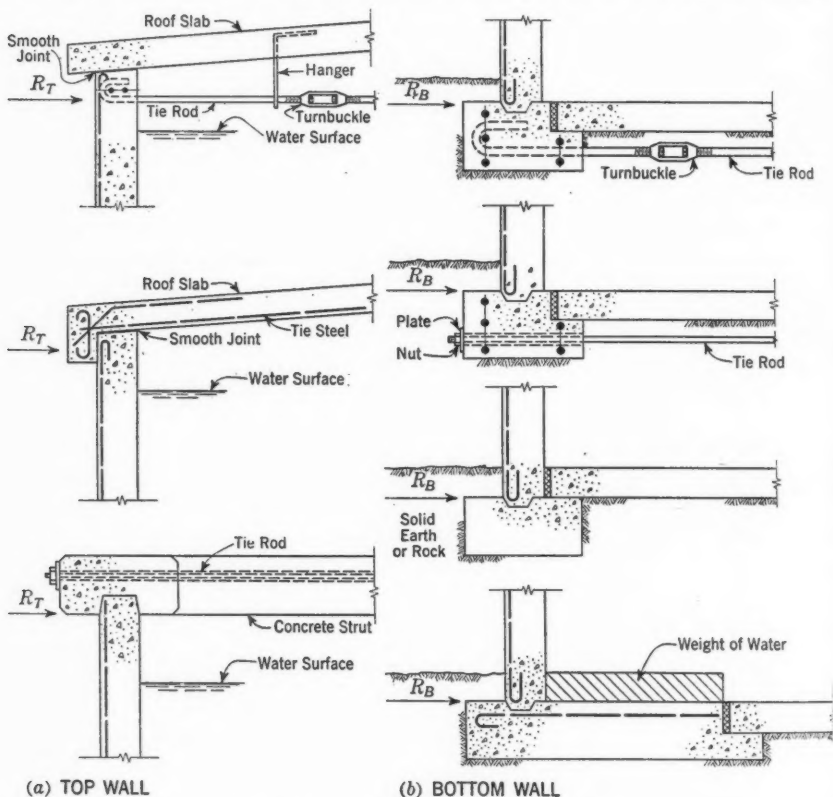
METHODS OF SUPPORTING THE WALLS
